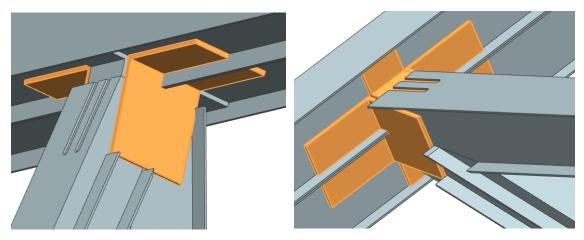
Leg Inner Side Brackets: Connection of a central Leg set to the Bottom Beams
